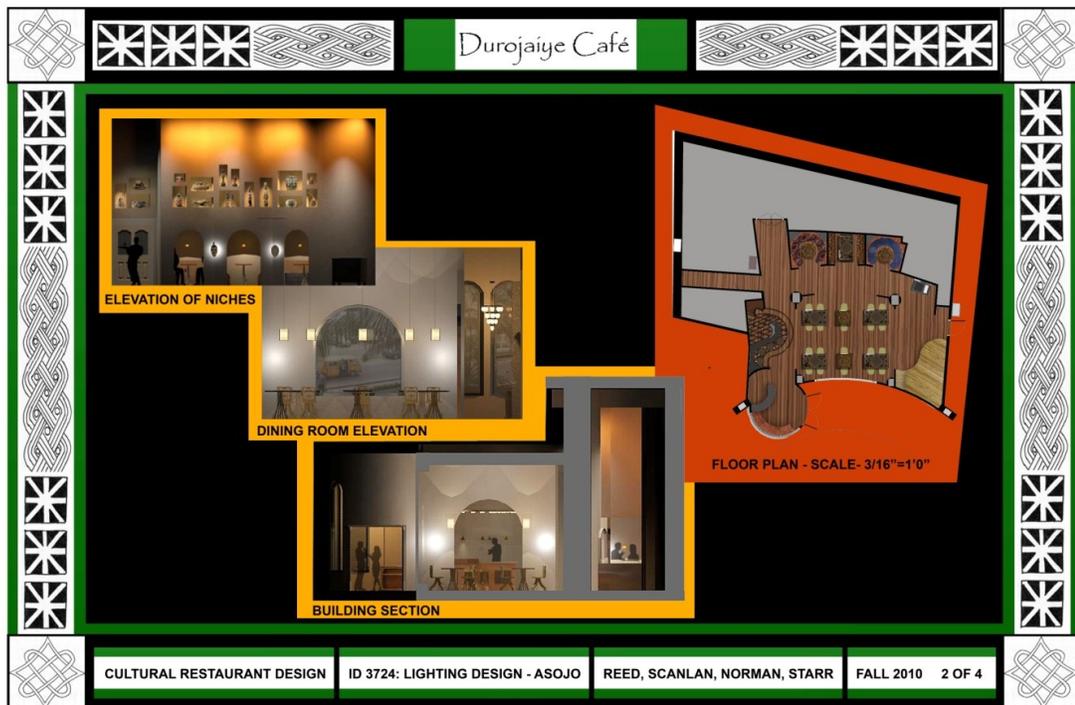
Plan and Elevations for Durojaiye Café (Group A).
